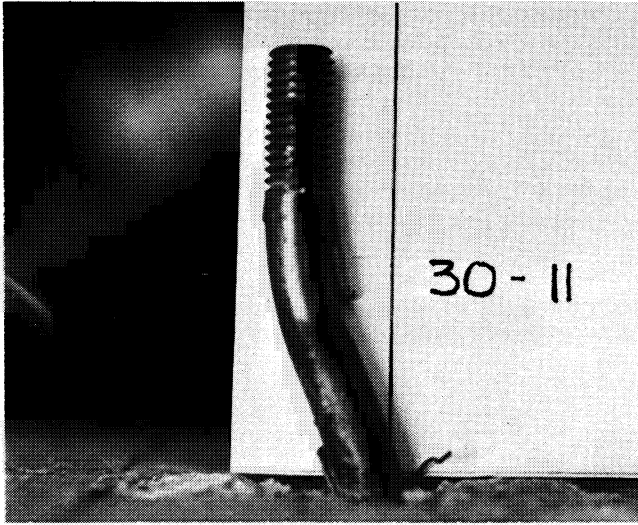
Anchor bolt failure; load applied at 30°
